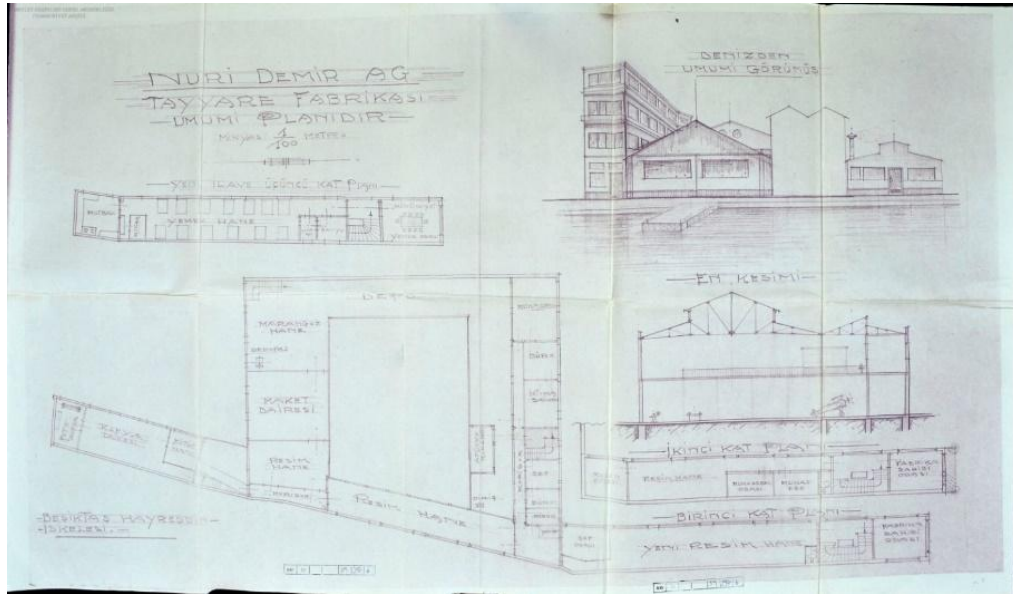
Nuri Demirağ Aircraft Factory, plan and section
